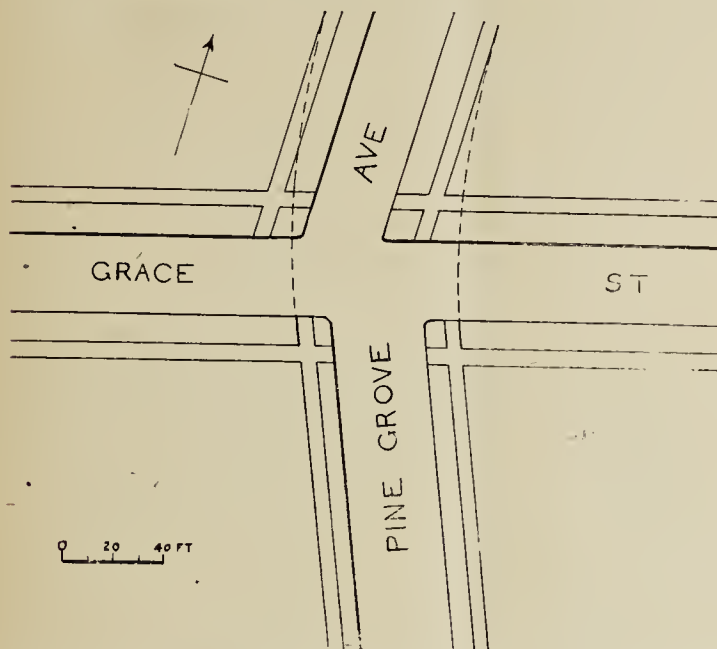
SHOWING PLAN OF AN ACTUAL STREET INTERSECTION. THE DOTTED LINES SHOW HOW A CURVE MIGHT HAVE BEEN USED TO ADVANTAGE.
